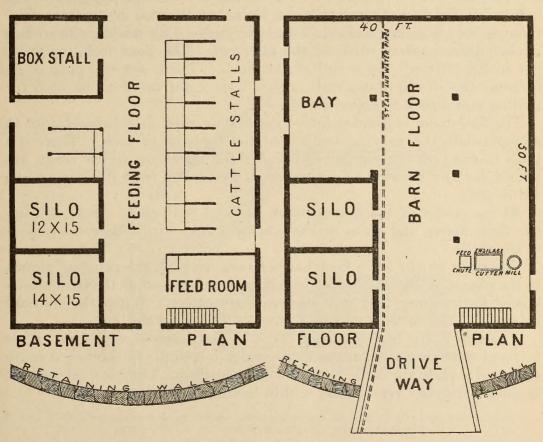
FIG. D.—BASEMENT AND FLOOR PLAN OF BARN.
